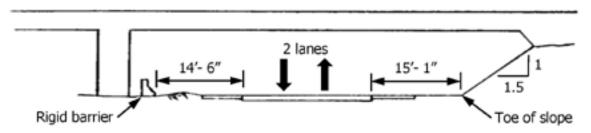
Bridge elevation view of a 2-lane, 2-way highway feature below the bridge, with a rigid barrier.
